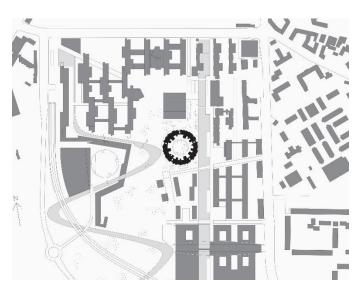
Circular building and the orthogonal structure of the site plan. (Retrieved from: https://www.ltarkitekter.dk/tietgen-en-0)
